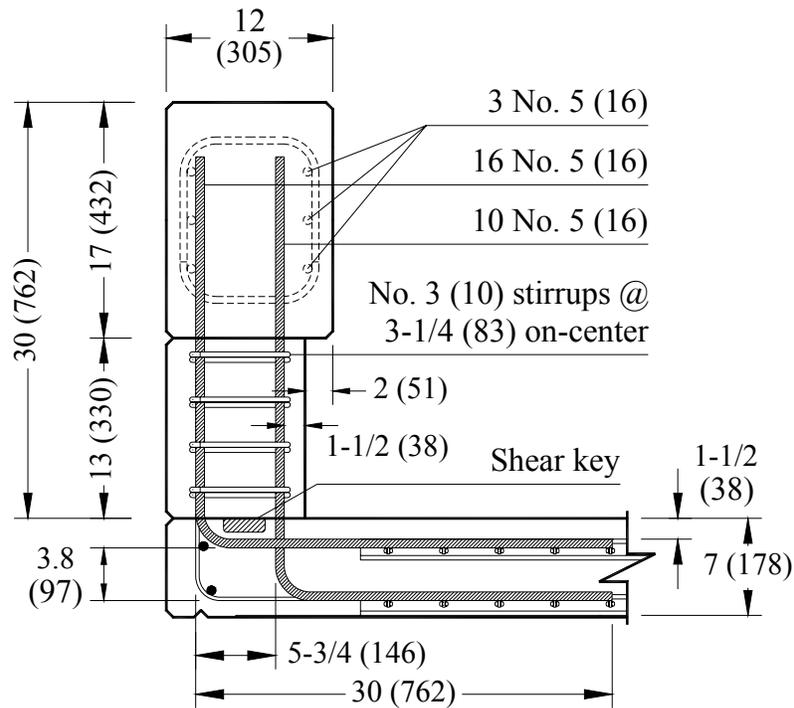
Reinforcement layout of post-deck connection. Dimensions in in. (mm).
